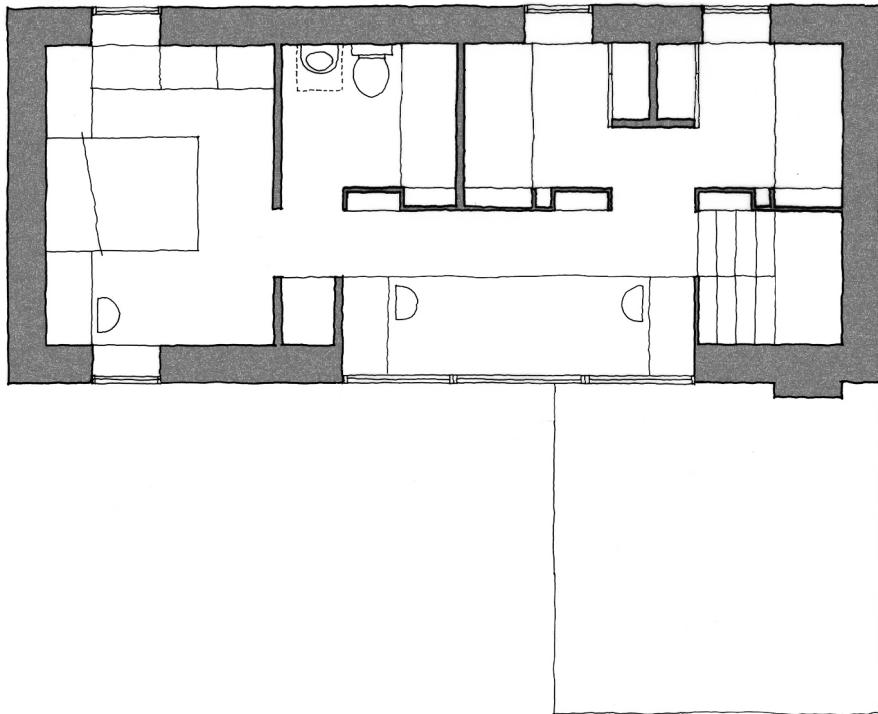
Upper floor plan of 3 bed house type at 1:100
